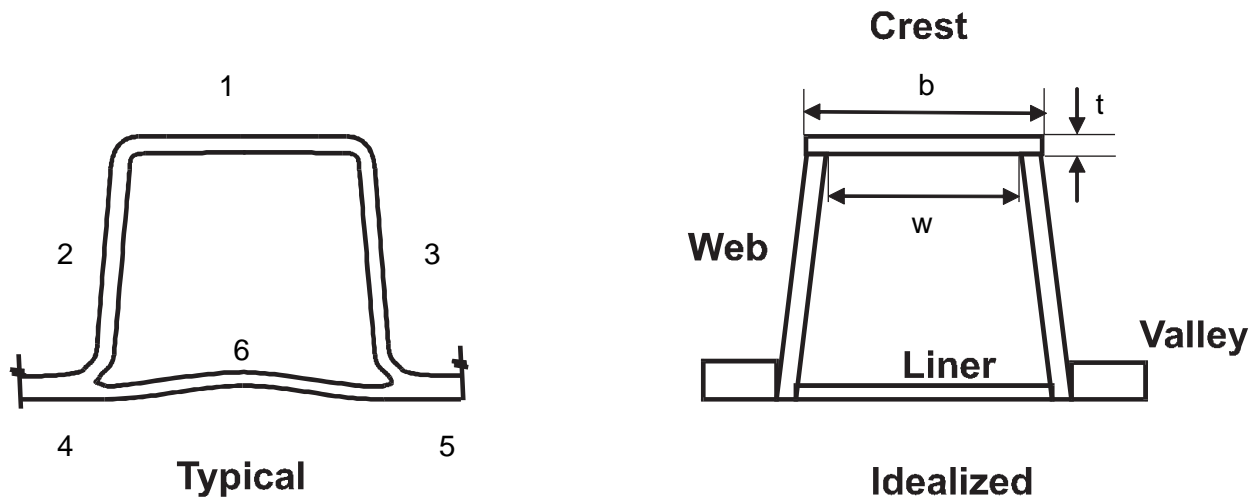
Idealization of profile wall pipe into rectangular elements.
